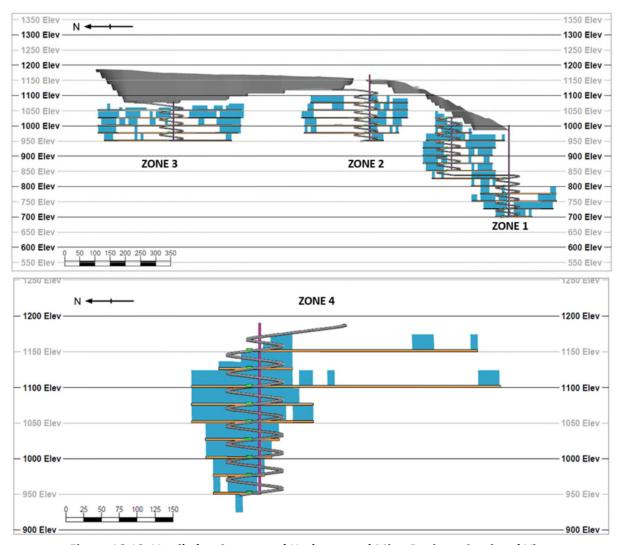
Vertikalny Conceptual Underground Mine Design – Sectional View
